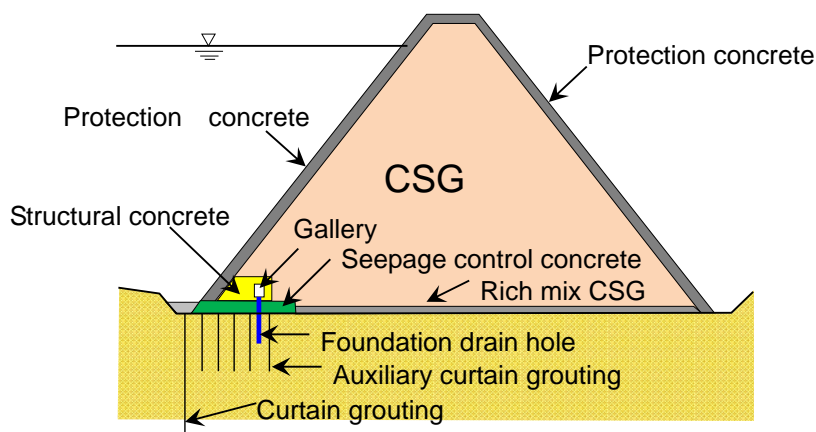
Standard Cross Section of the trapezoidal CSG dam
